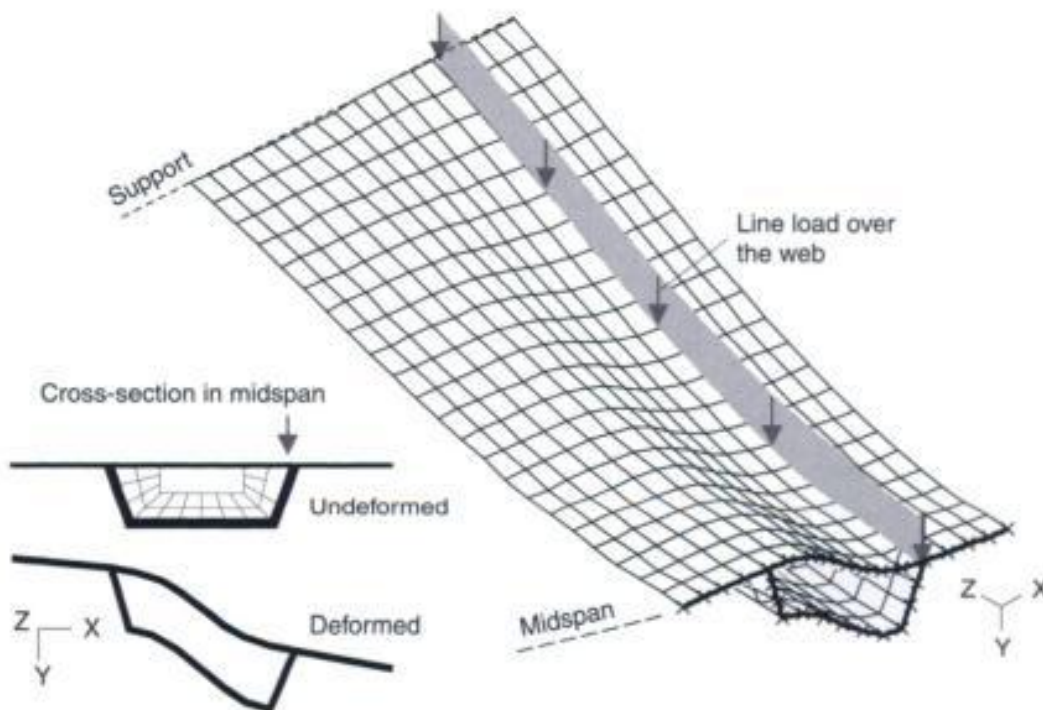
3-D shell model of a hollow box girder bridge (only one half of the structure is shown)
